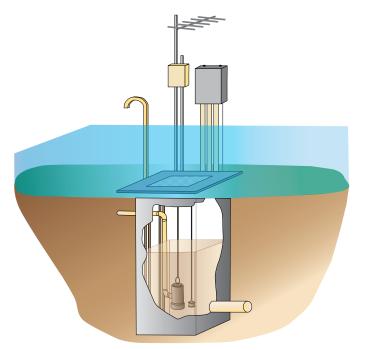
Extend vent pipes and electrical controls above the flood elevation at lift stations.
